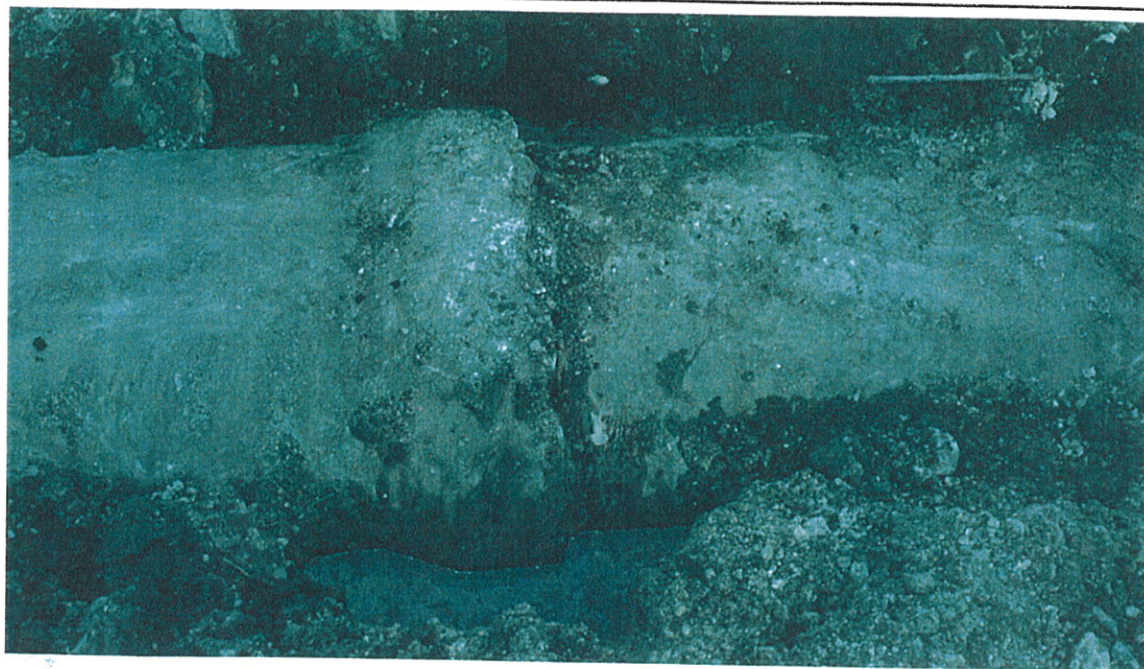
PLATE III: North Test Pit excavation close up of concrete drainpipe. Note leakage of waste petroleum products at pipe coupling.
